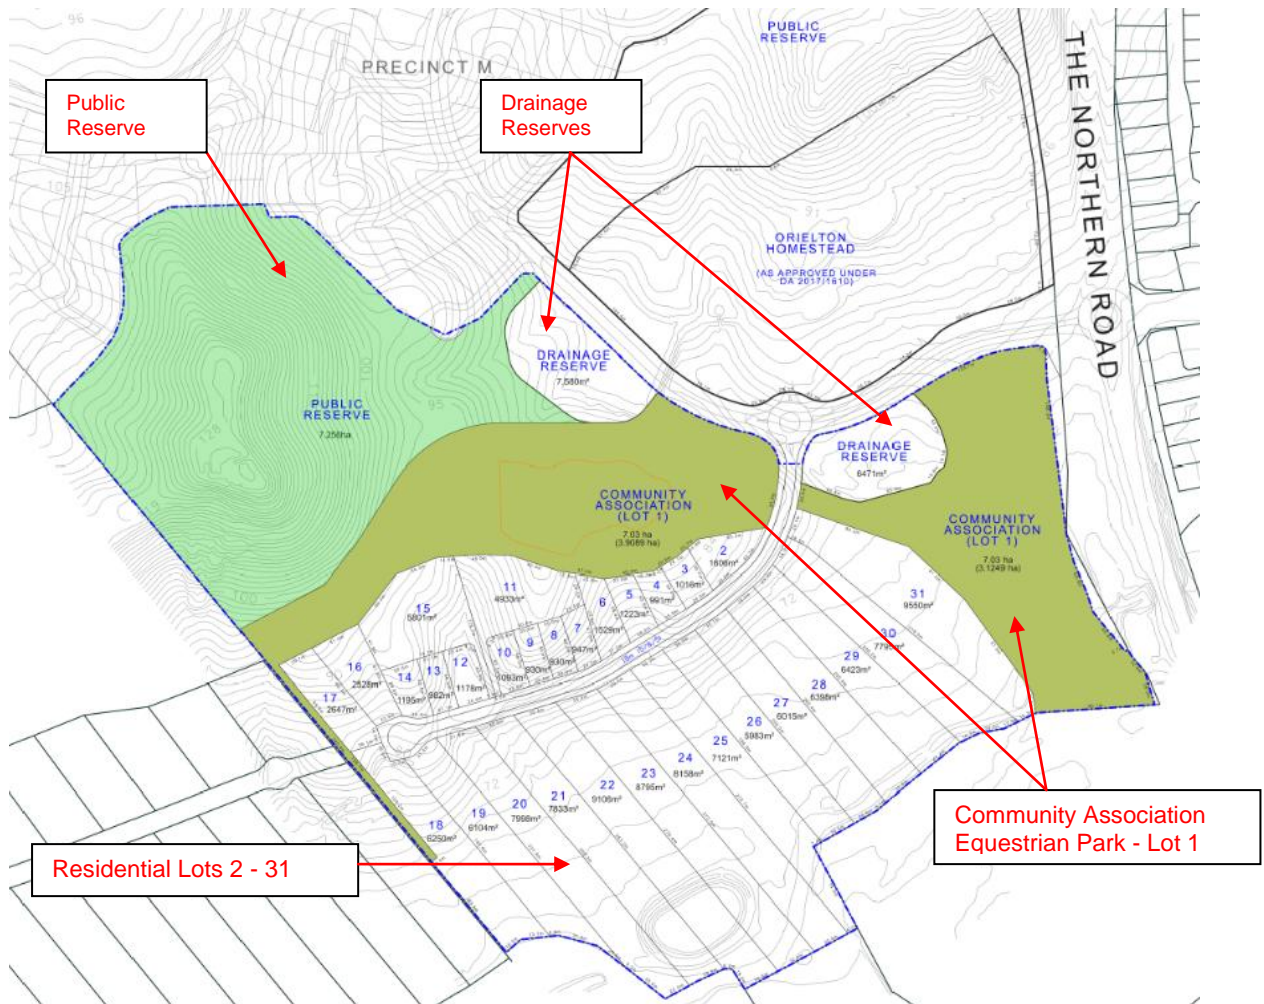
Subject Site – Lots 1 & 31. (Part of Precinct O – Subdivision Plan) N↑
